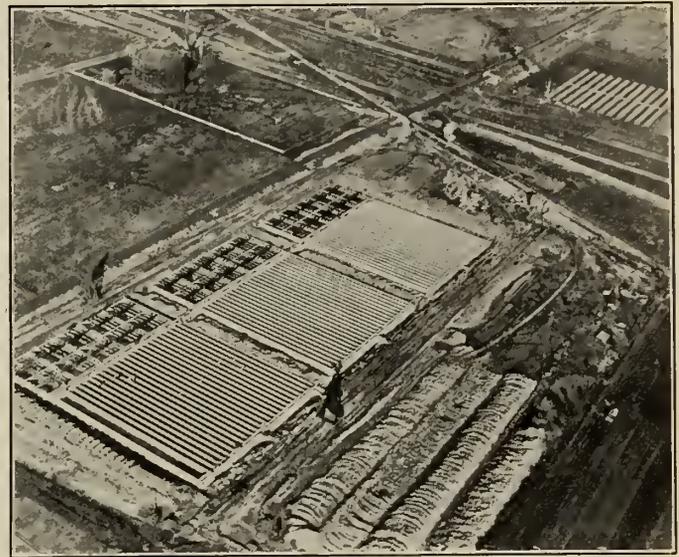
North Side Sewage Treatment Plant under Construction.
